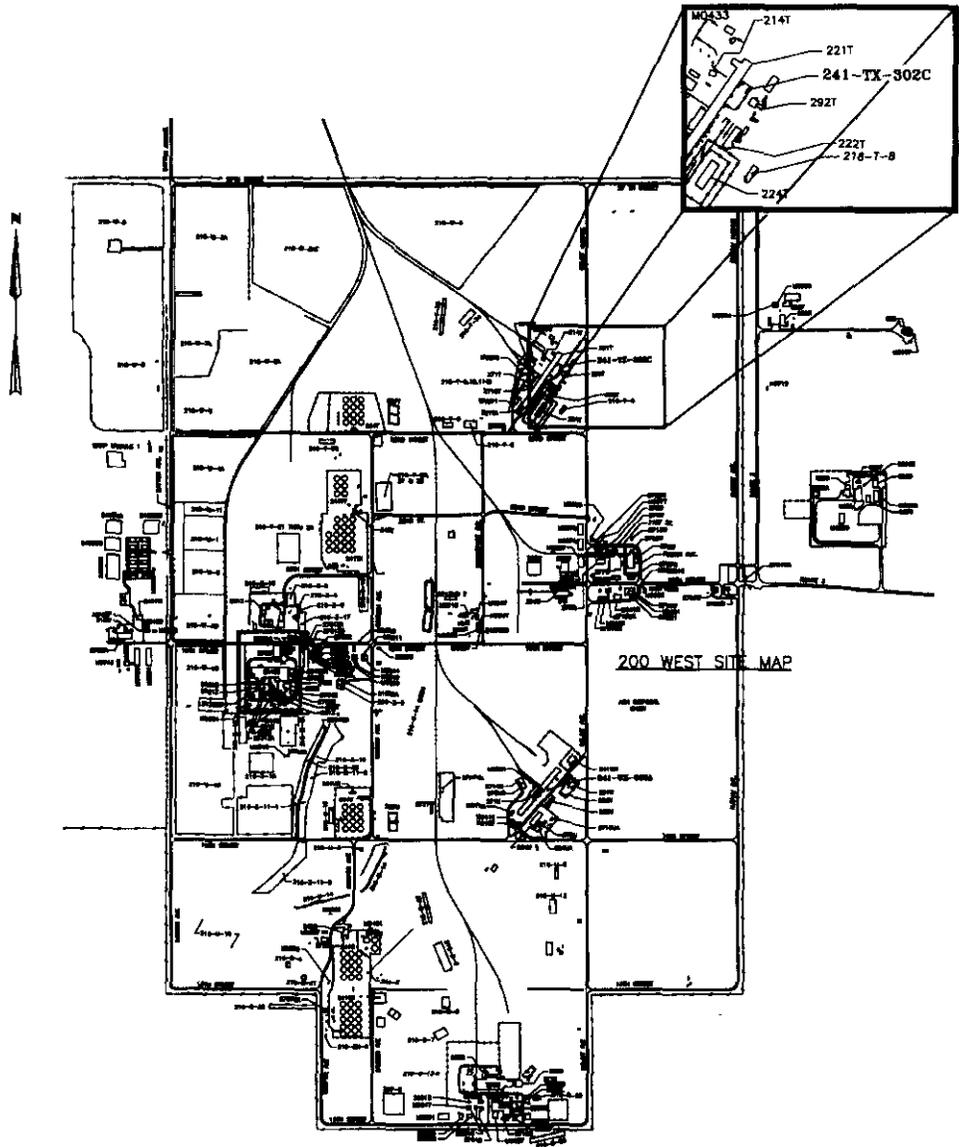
SITE PLAN – 241-TX-302C Catch Tank.
